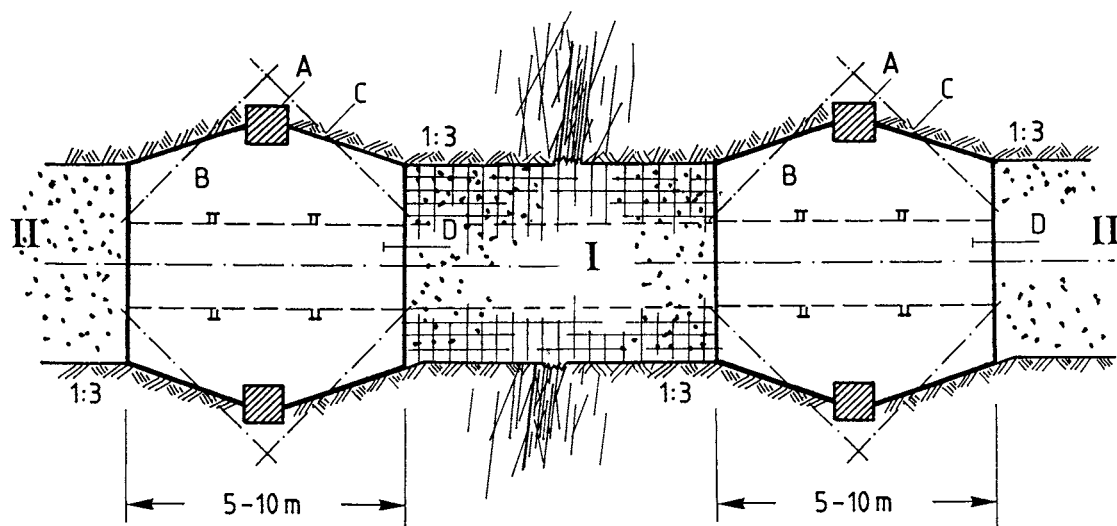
Concrete plugs cast in recesses and equipped with “O-ring”-type bentonite sealings (A) and grouting holes (C) for isolating a water-bearing fracture zone. I) is bentonite block masonry, II) is dense on-site compacted backfill
